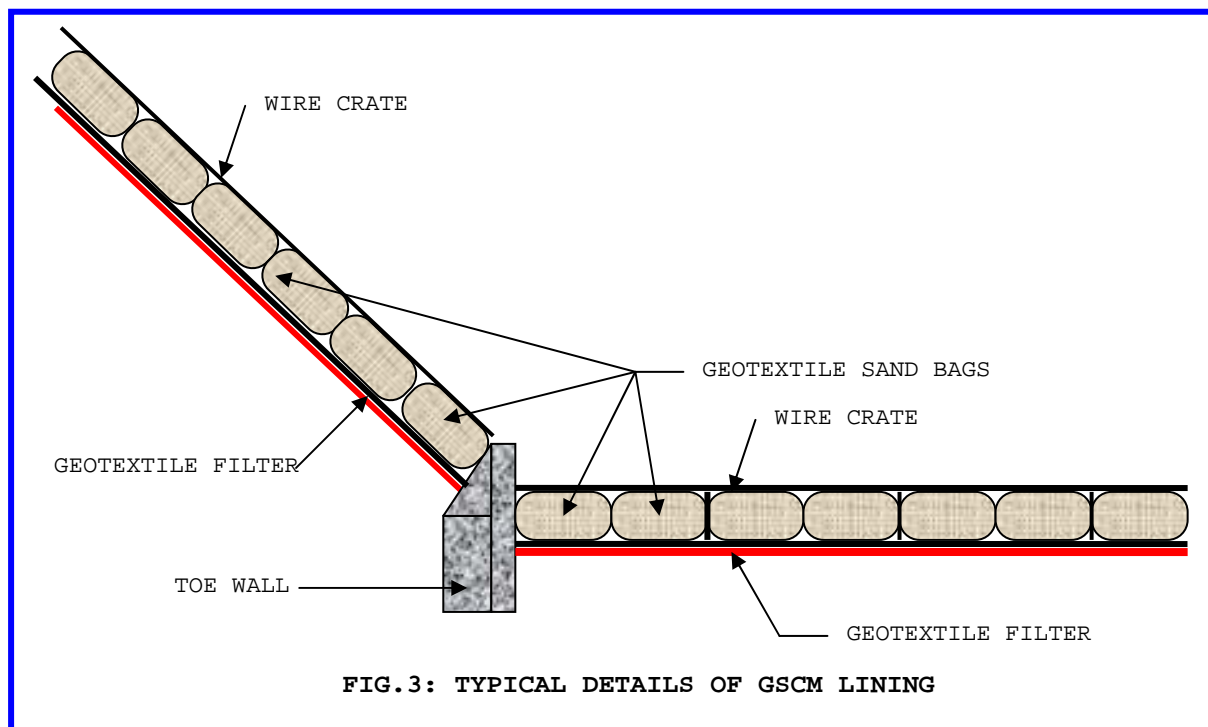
TYPICAL DETAILS OF GSCM LINING
